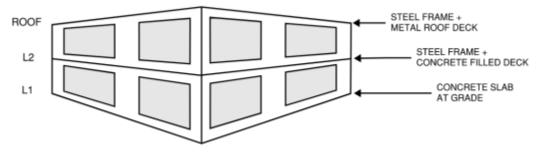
Two Story Building for Horizontal Gravity System, courtesy SE 2050
